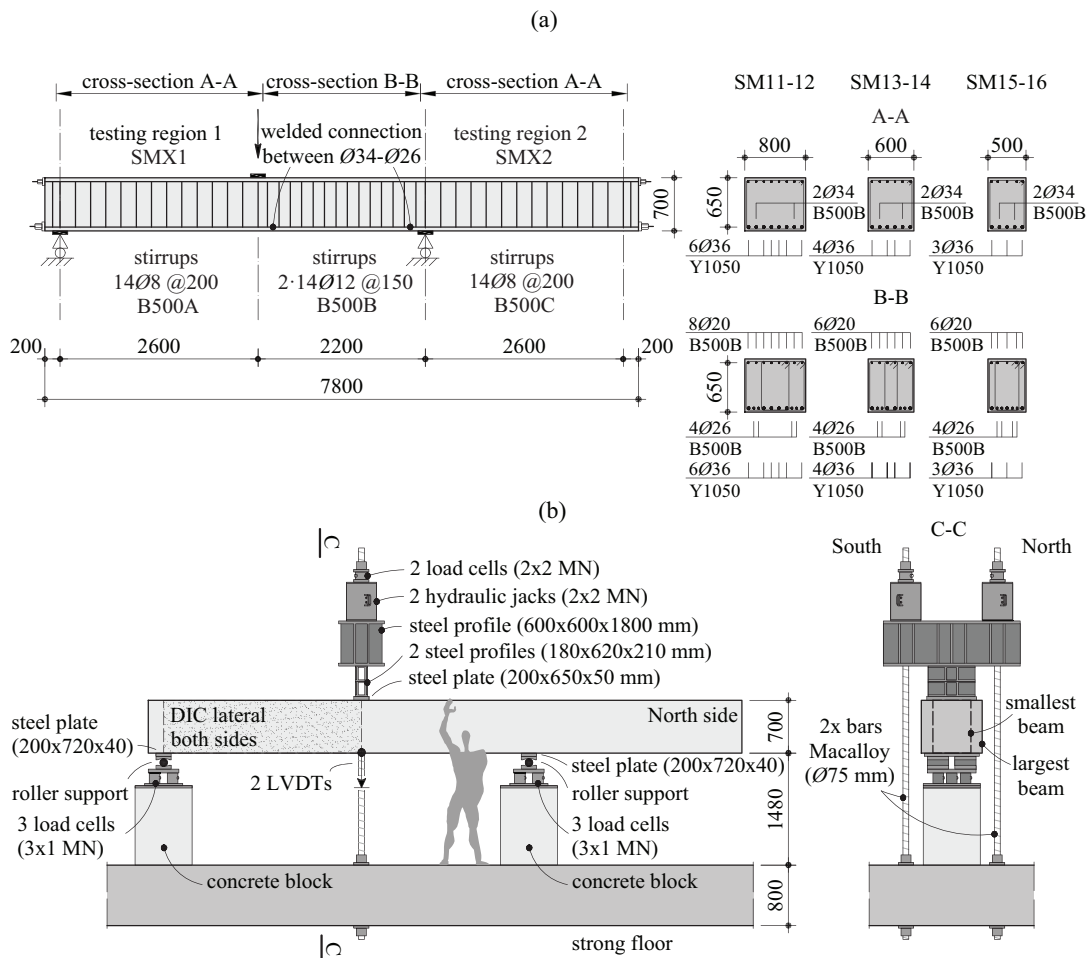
Series SM10: (a) geometry of specimens with reinforcement layouts; and (b) test set-up.
